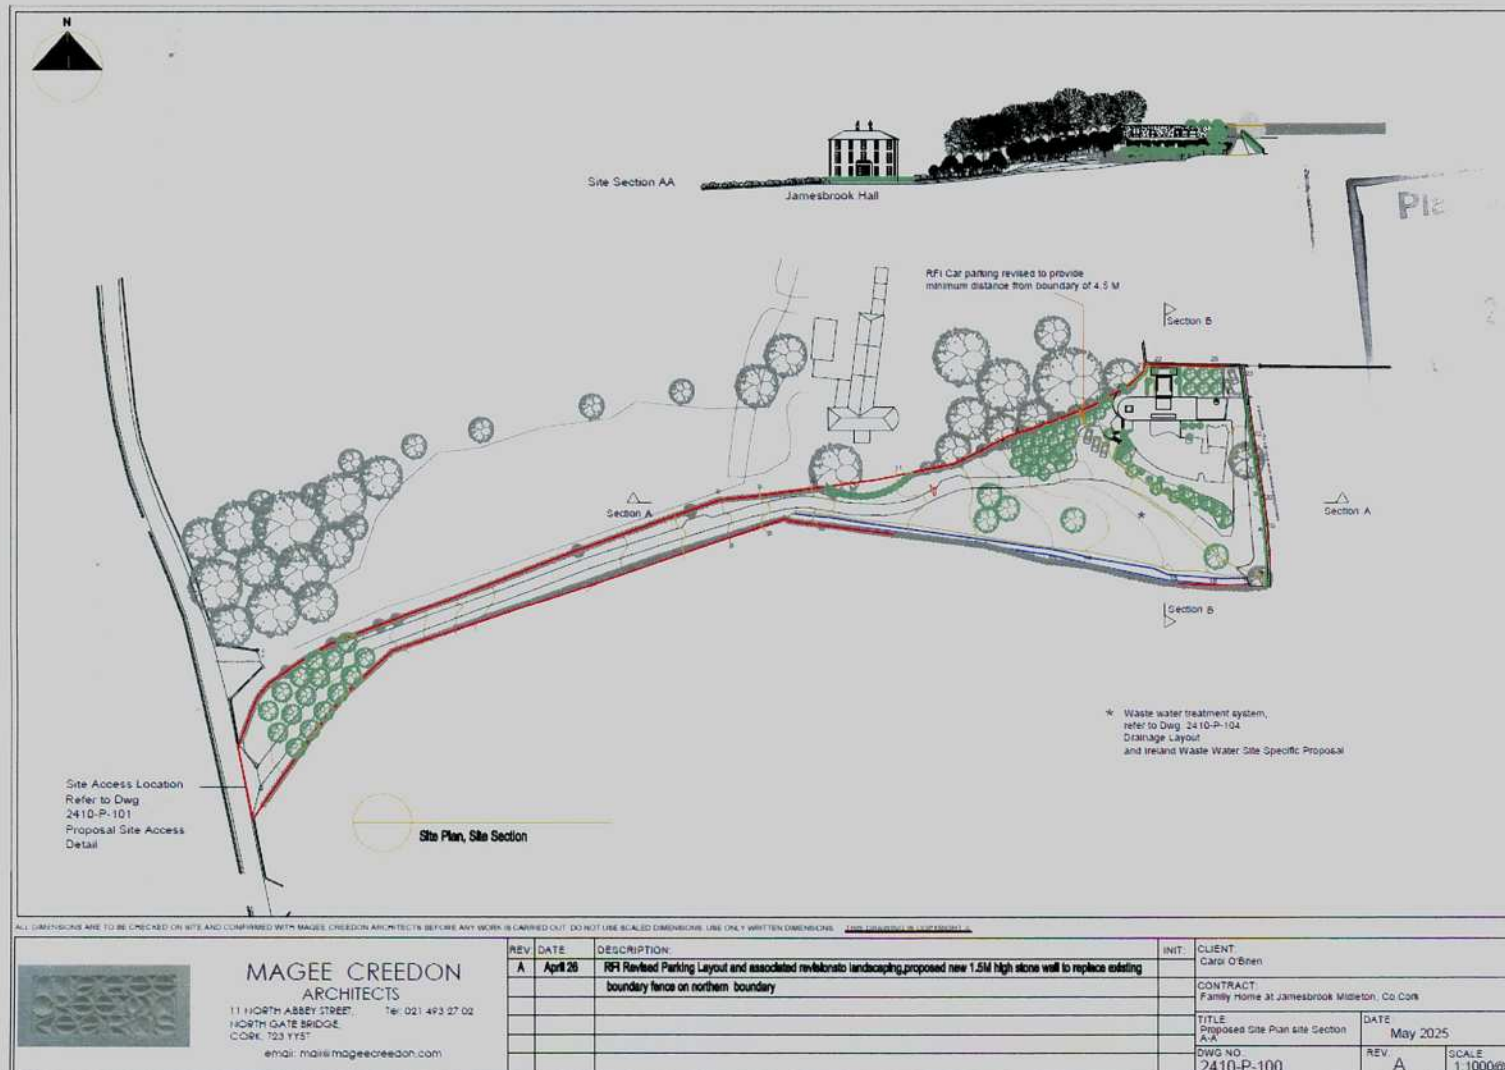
Proposed site layout plan (Source: Magee Creedon Architects, 2025, Revised April 2026). Please refer to submitted drawings for more detail
